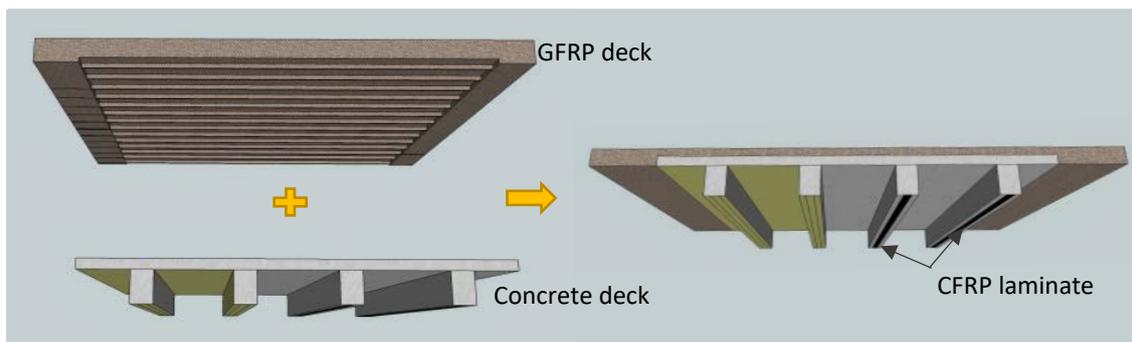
SUREBridge concept—externally bonded (EB) prestressed CFRP laminates on the bottom of girder (tensile part) and GFRP panels on the top of the existing concrete deck (compressive part)
